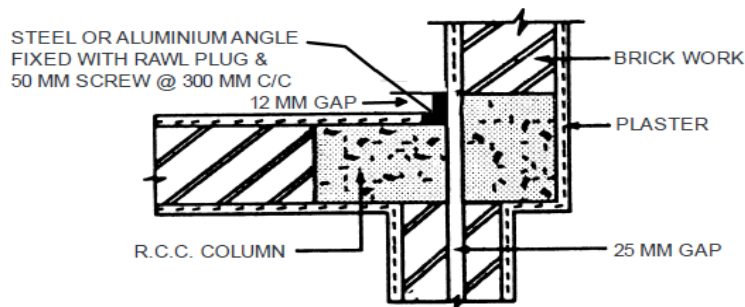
Typical Details of Expansion Joints at Corner Column
